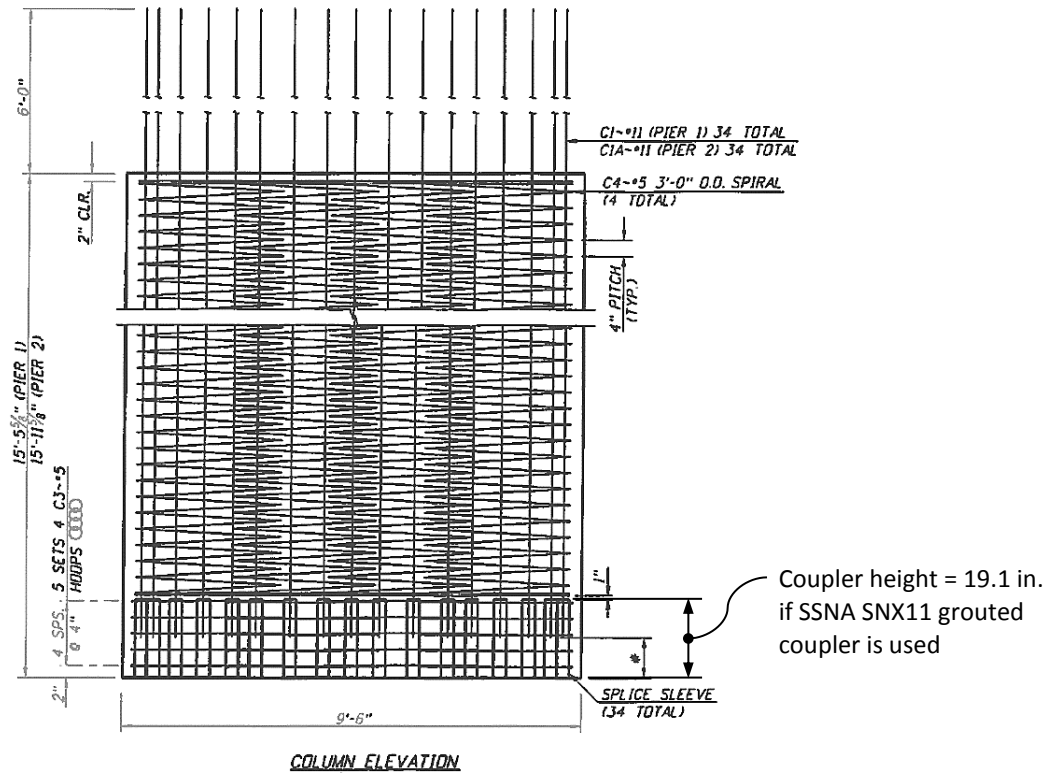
Salmon River Bridge Close-up View of a Column Showing Grouted Coupler Locations (NTS)
